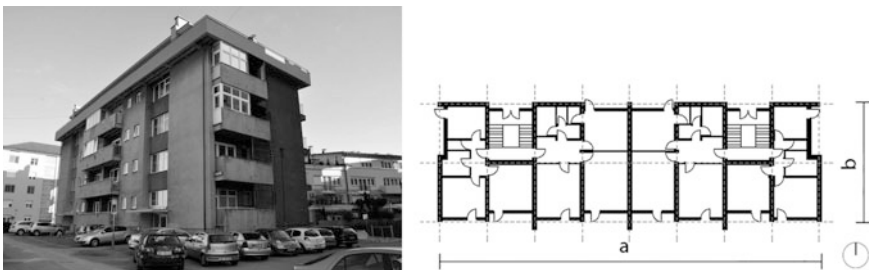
Existing case study building—EB A (left) and its floor plan (right) [60]
